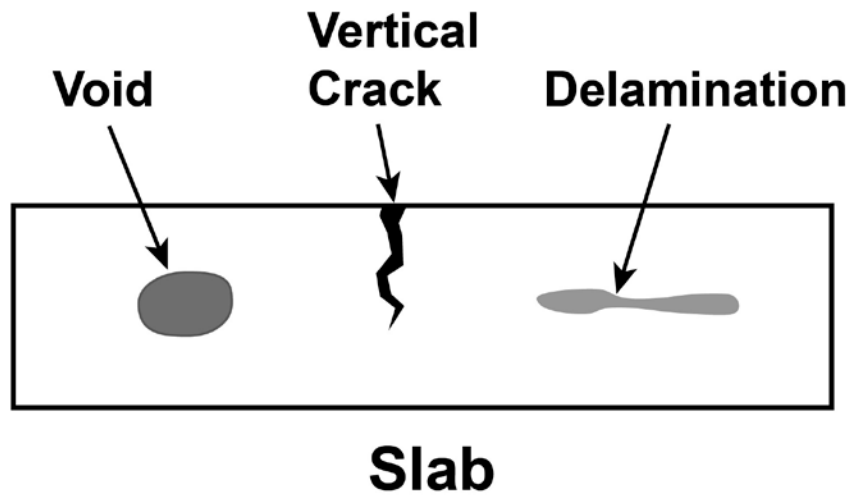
Figure II. Illustration of Delamination, Void, and Vertical Crack in a Concrete Slab Specimen
